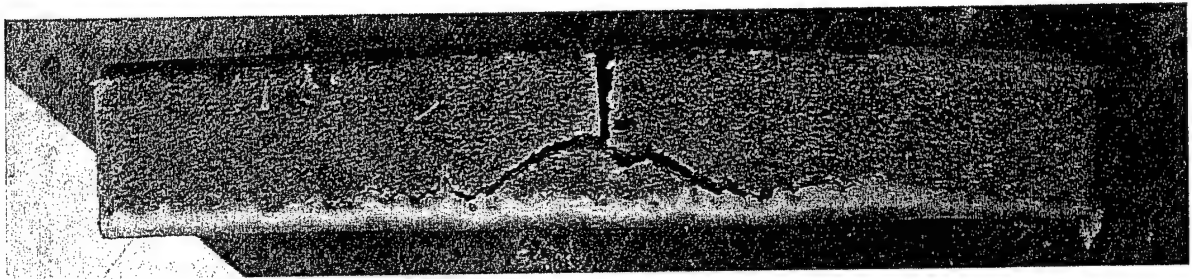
Gas Gun Test 2, Sample 2 Side View
